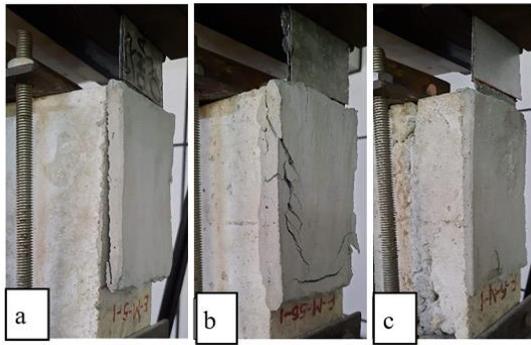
Failure patterns of ES FRP/concrete system tested using developed PET-ECC adhesives [47]
